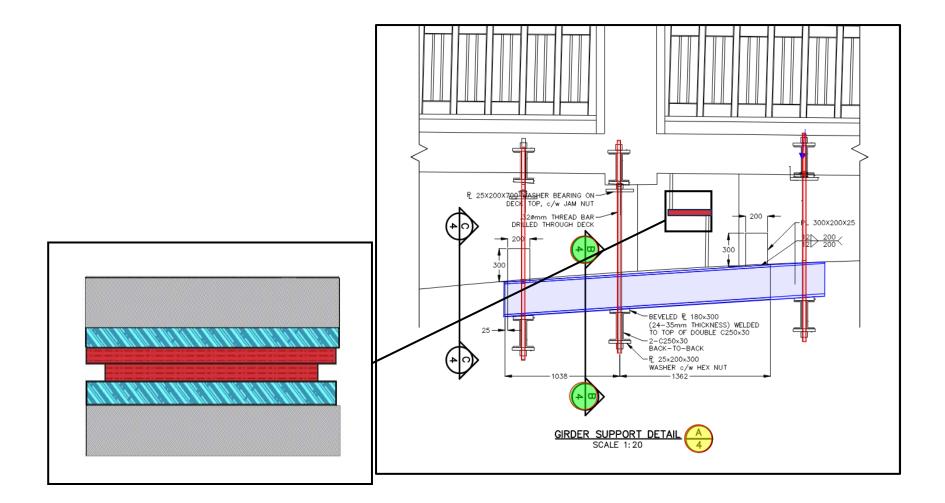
Provides an example of half-joint repair to replace the internal concrete and metal elements and by use of a temporary girder support system.
